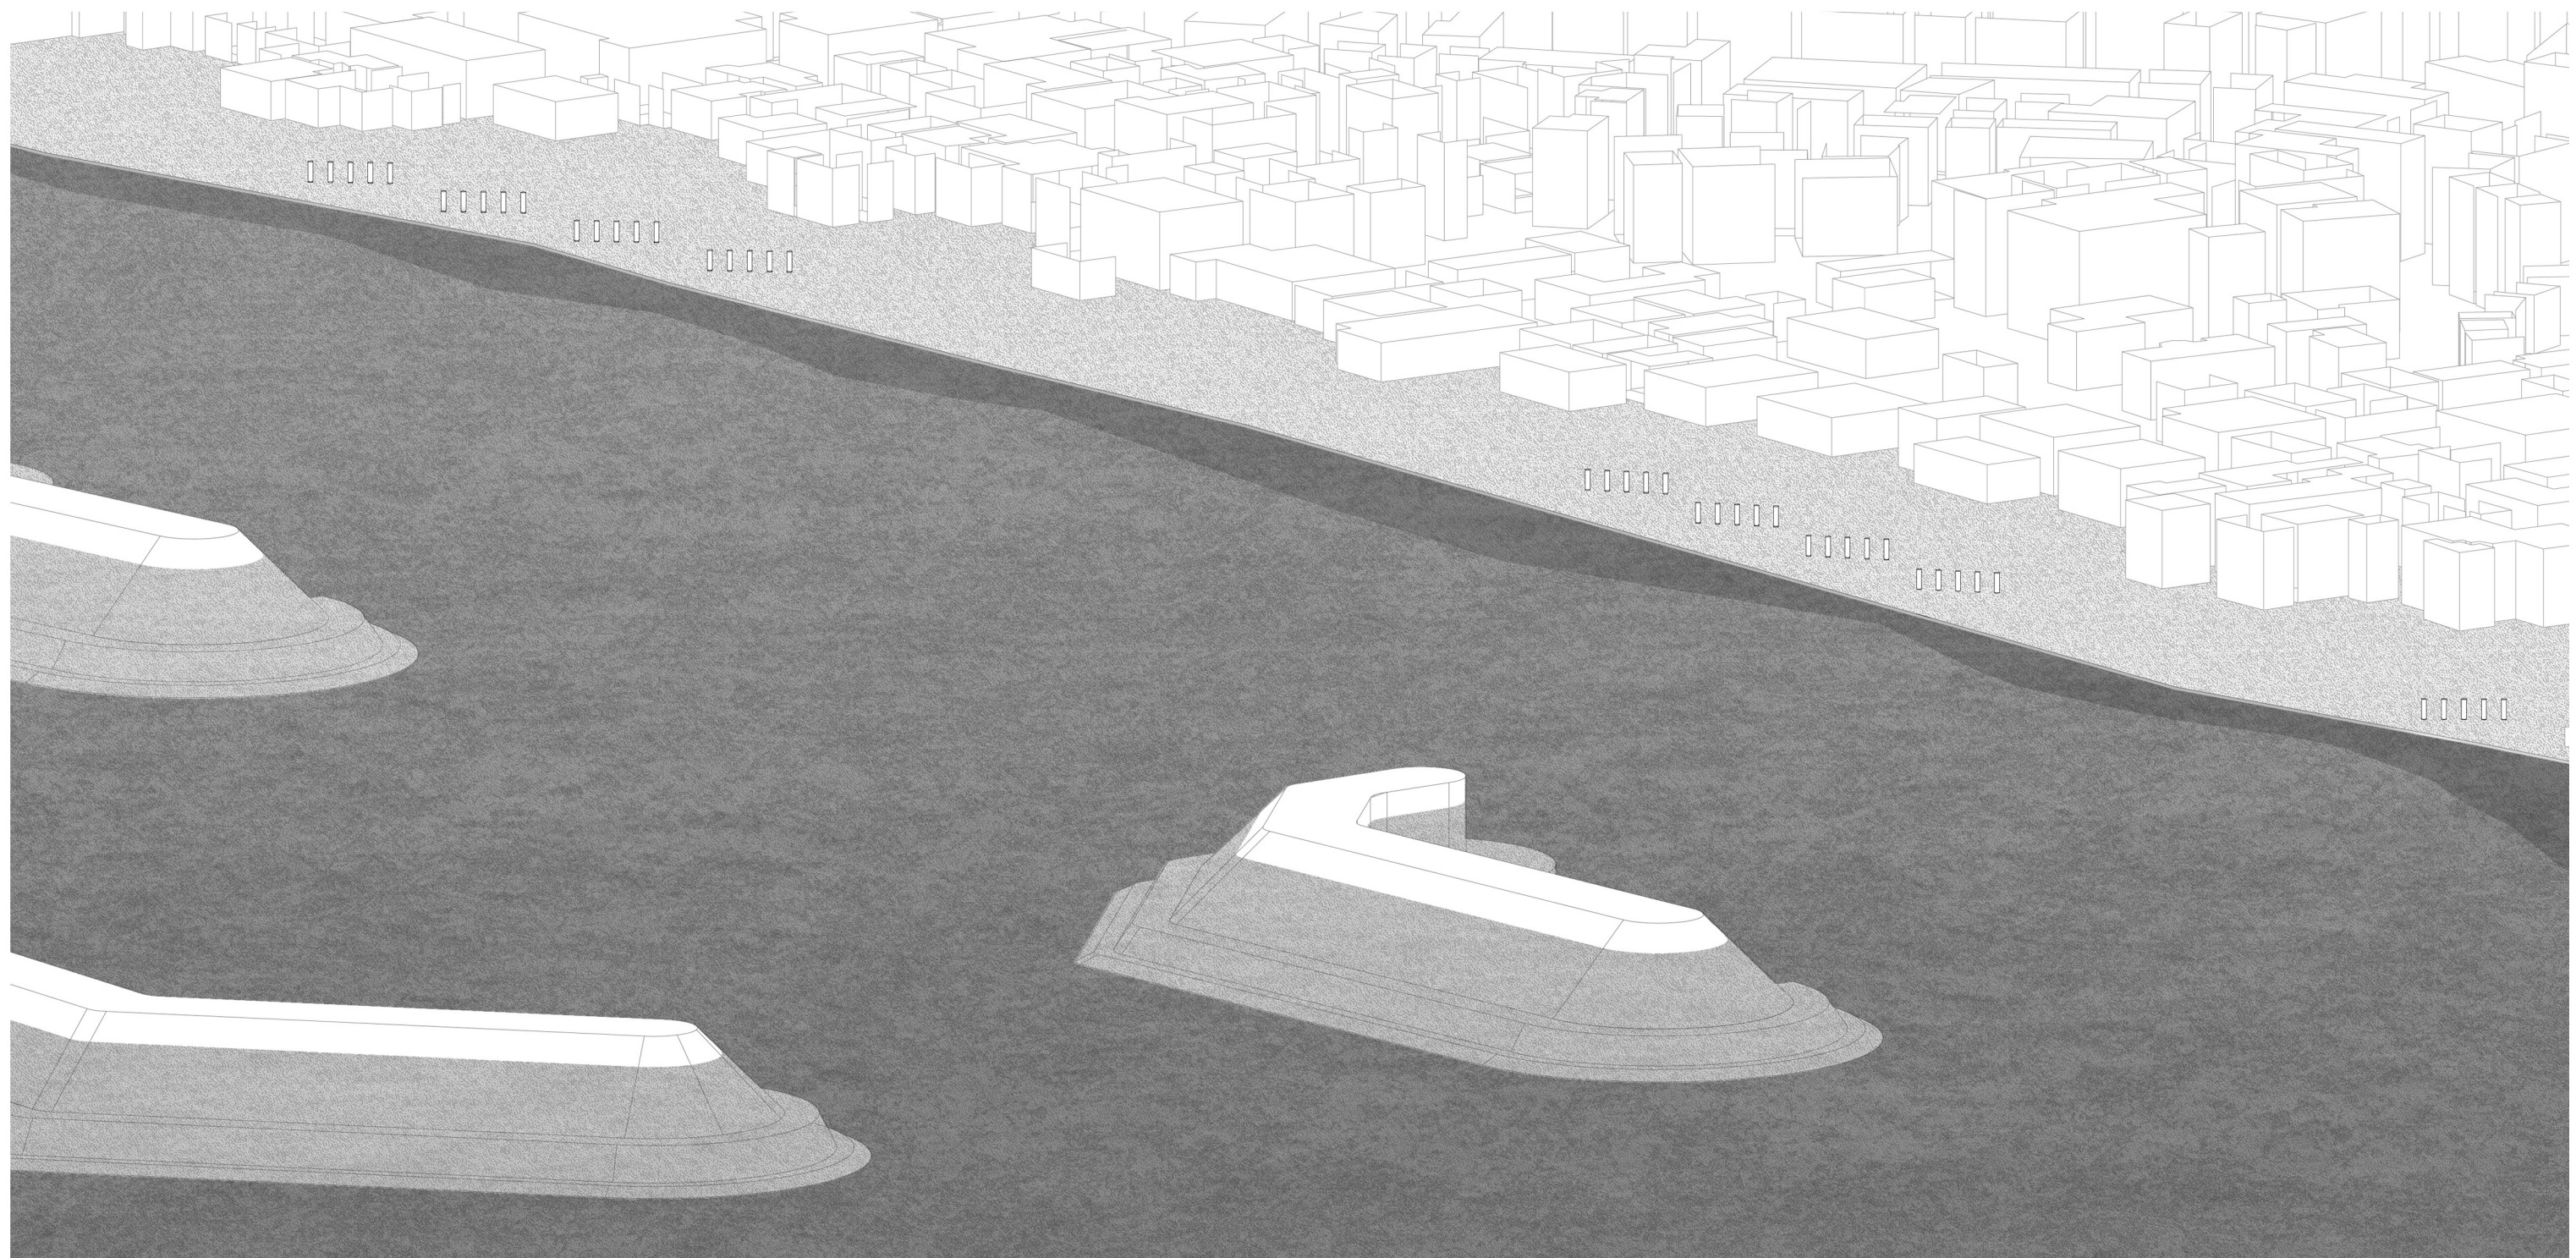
Ramlet al Bayda and Ouzai Key plan
